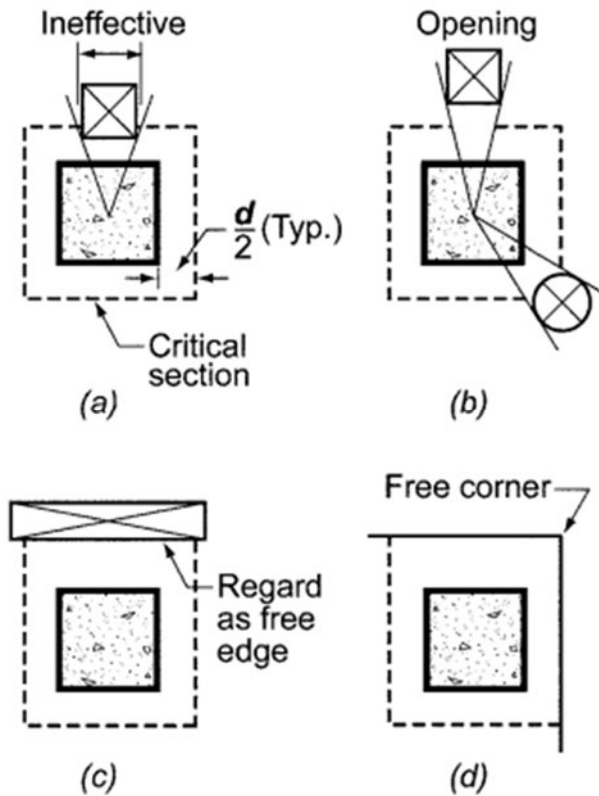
Openings close to loaded perimeters – Figure R22.6.4.3 in the code (American-Concrete-Institute, 2014)
